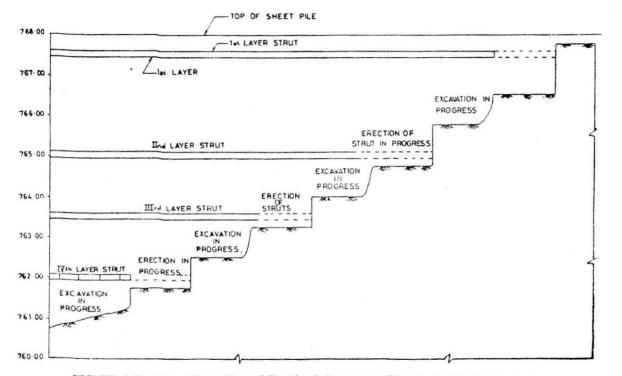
Sequence of Excavation and Strutting in Longitudinal Direction Loktak H.E. Project.
